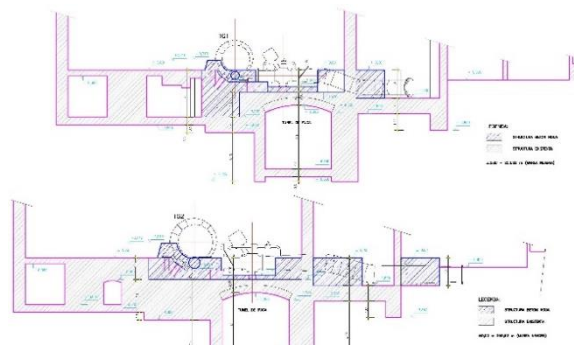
Cross-view by Grebla HPS pointing out some of the intervention structural works
